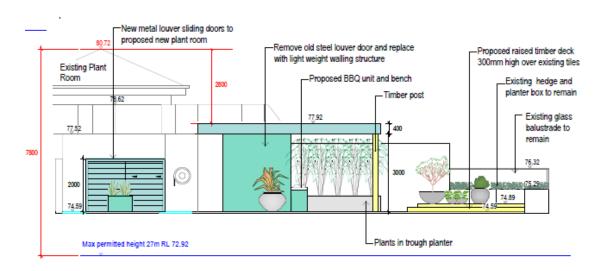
Section DD - Proposed new plant room, pergola structure, new wall to bathroom and new raised decking.
